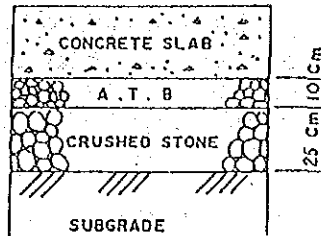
Rigid Pavement Structure for Project Road
